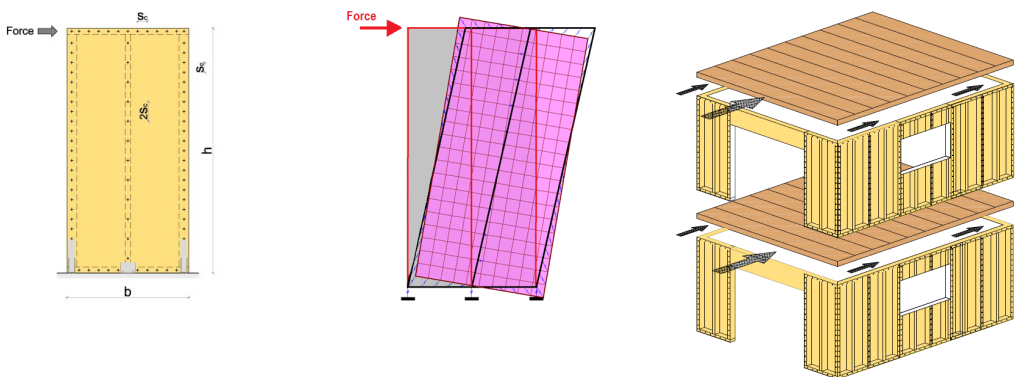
Horizontal force distribution in wood framed building (top) – Single wall geometry and deformation (bottom)
